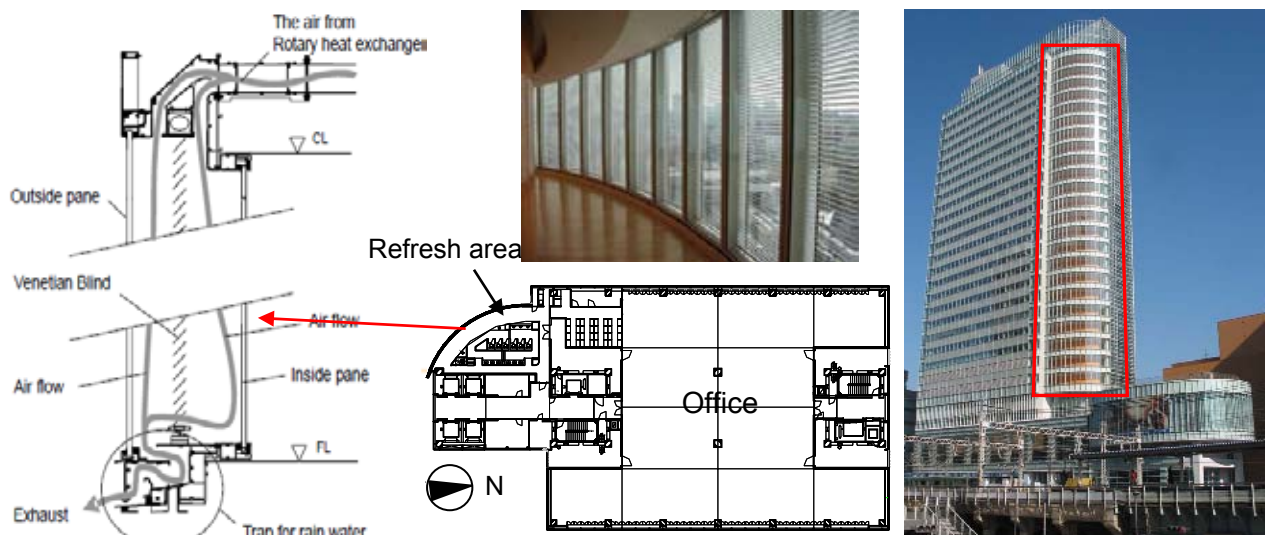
Exterior / interior view of EXAFW and typical floor plan
